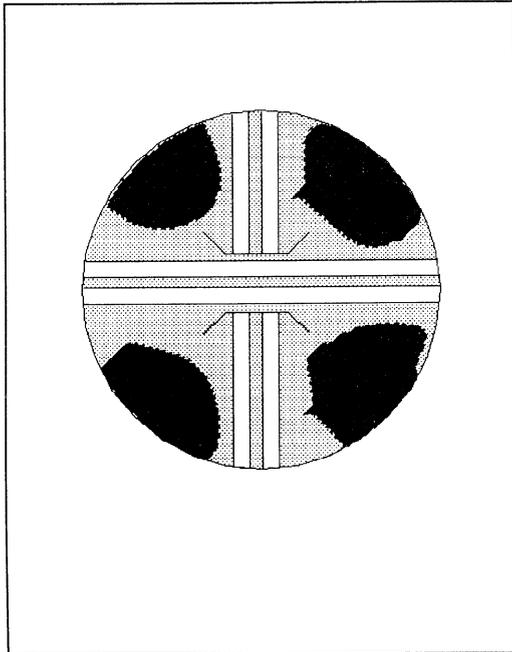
A brunnel at the crossing of 2 dual carriageways
